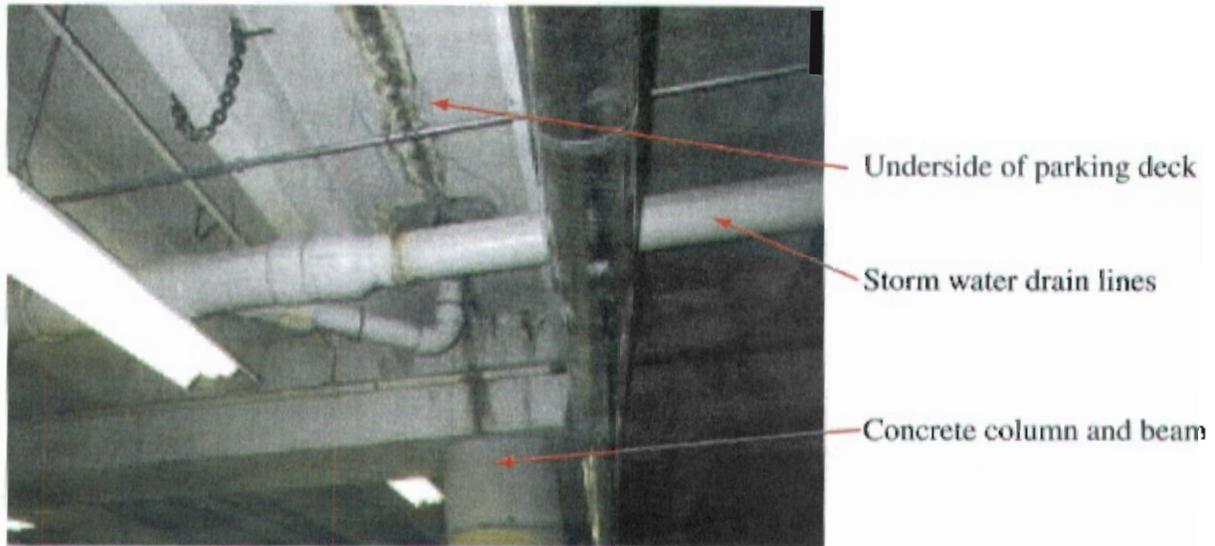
View of the underside of the concrete parking deck showing piping that collects drainage from the surface above.
